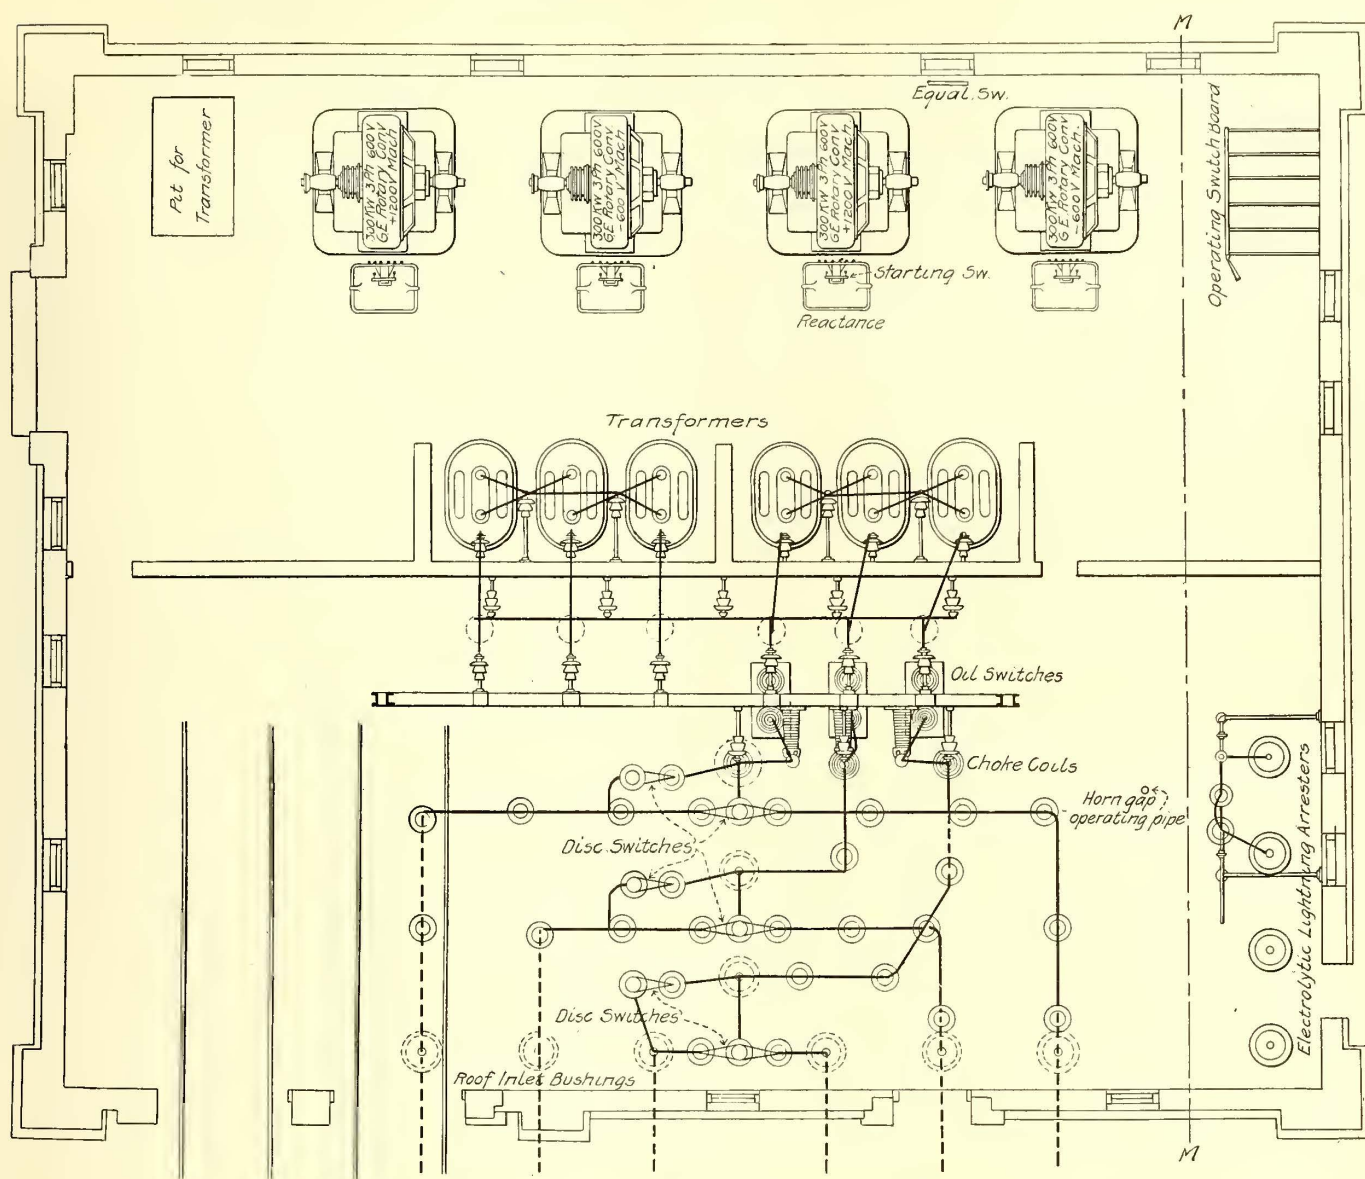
Milwaukee 1200-Volt Line—Plan of East Troy and Burlington Substations. (For Section, See Fig. 11)
